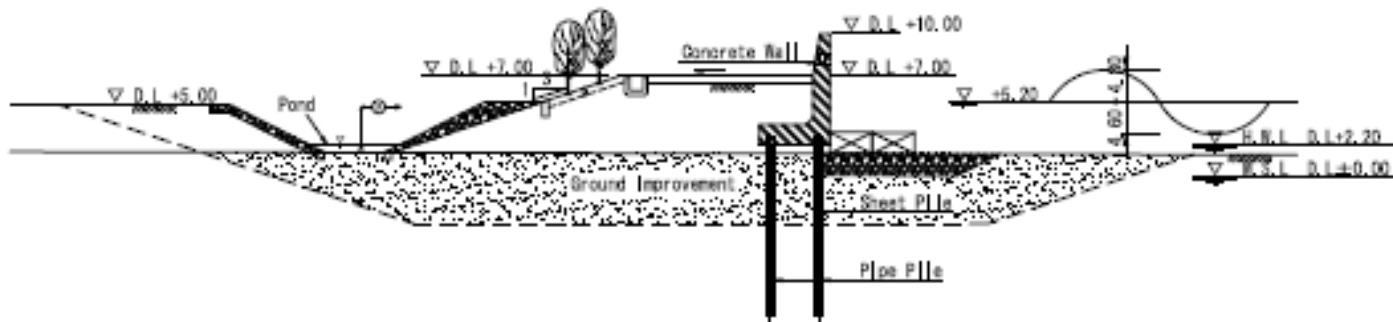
Case 1 Typical Section of Seawall type
